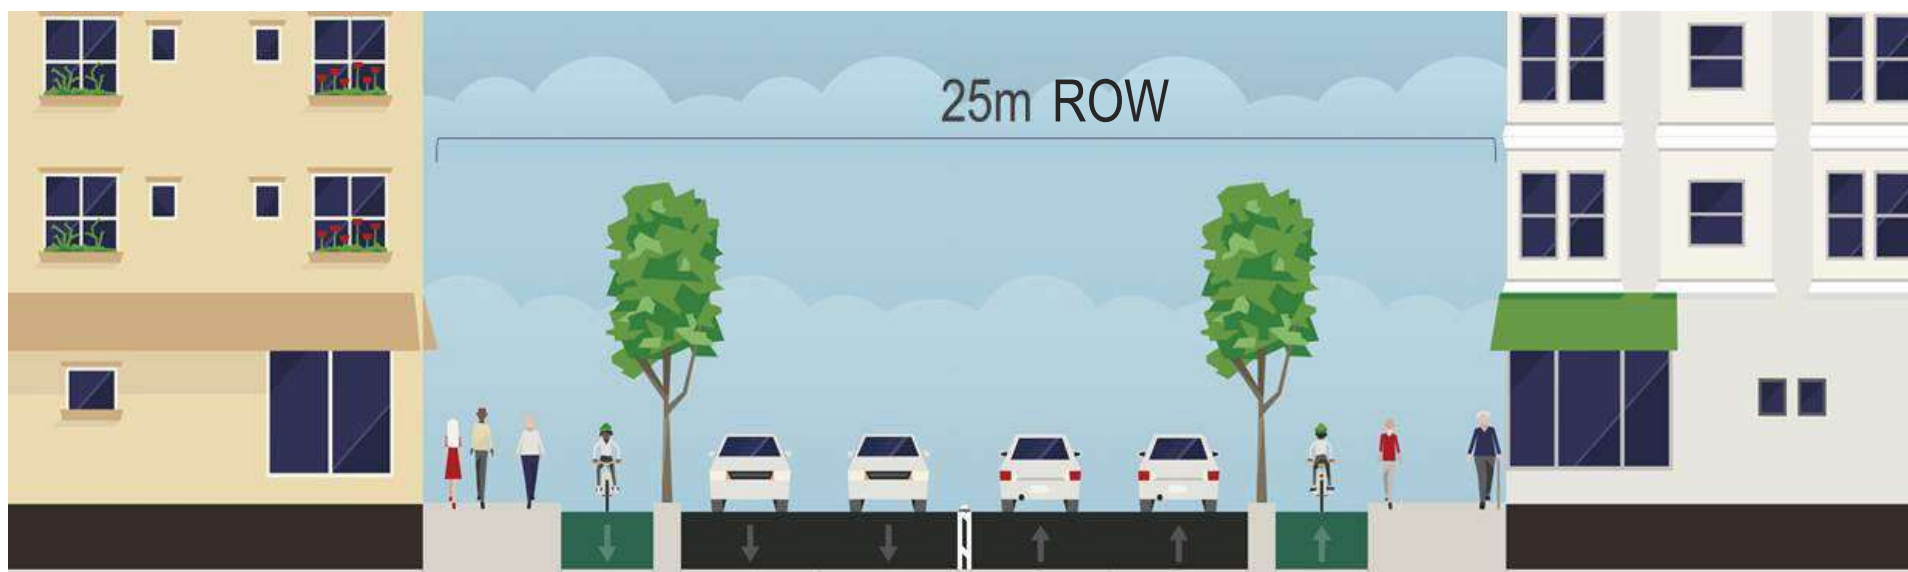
Richmond Road street cross-section (SURP, 2019)
